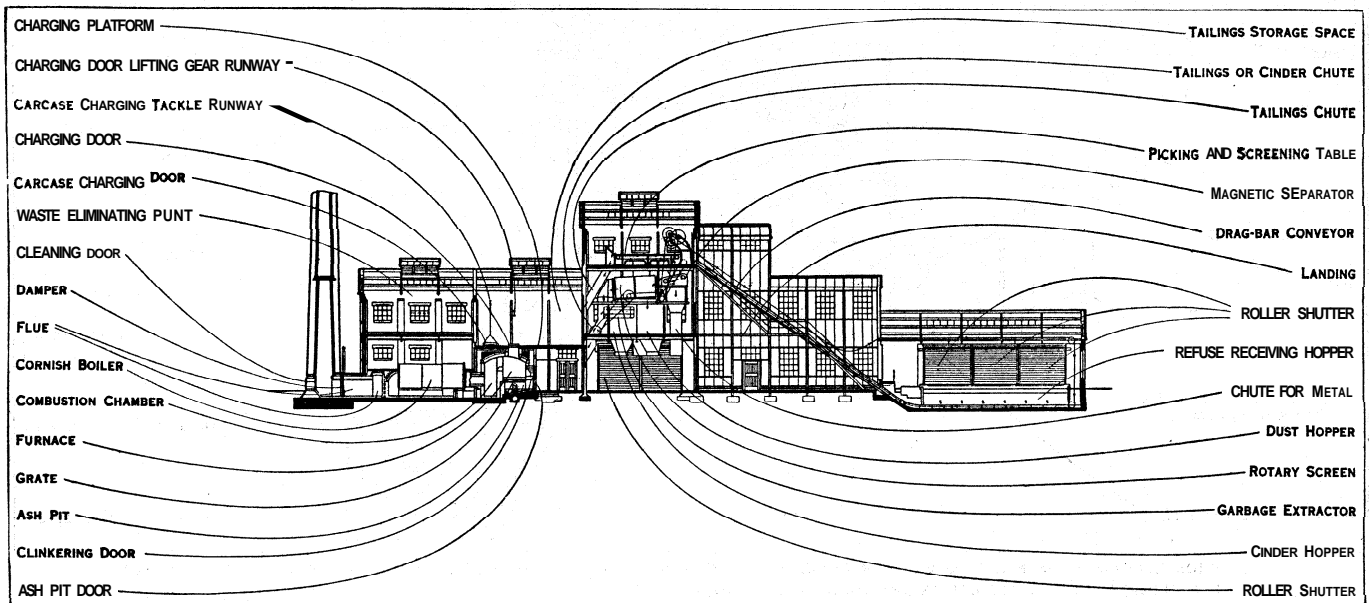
LONGITUDINAL SECTION OF REFUSE DISPOSAL PLANT OF THE NEW DESTRUCTOR COMPANY, WITH REFUSE-SCREENING PLANT
